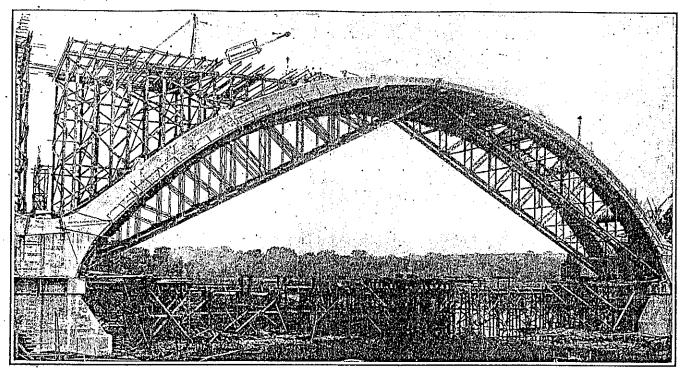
COMPLETED ARCH RIBS ON STEEL CENTERS
